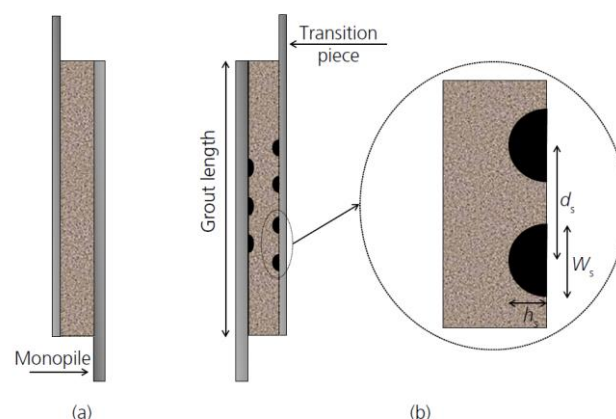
Grouted connections (a) without and (b) with shear keys [11]
